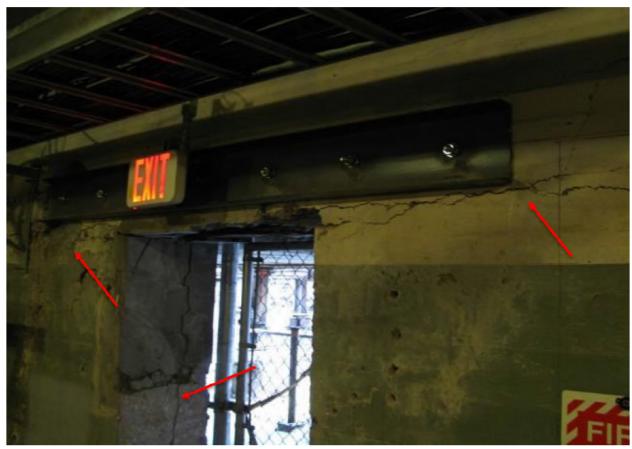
Horizontal cracks in Unit 4 Substation Building basement wall near eastern door, and vertical crack in the wall section at the door opening
